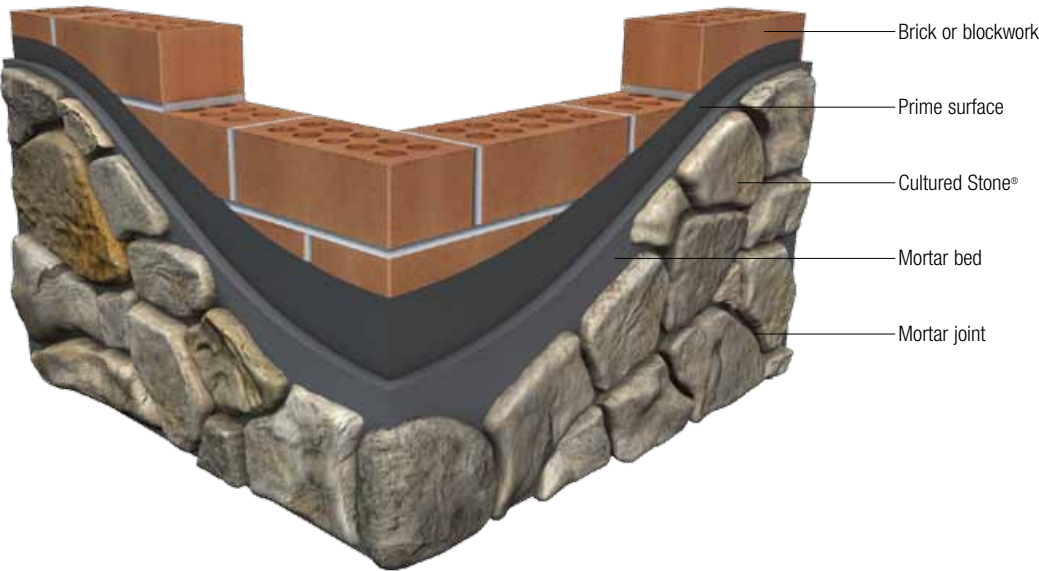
Brick or Block Work Typical Construction (Dwg # CS-01.02)
